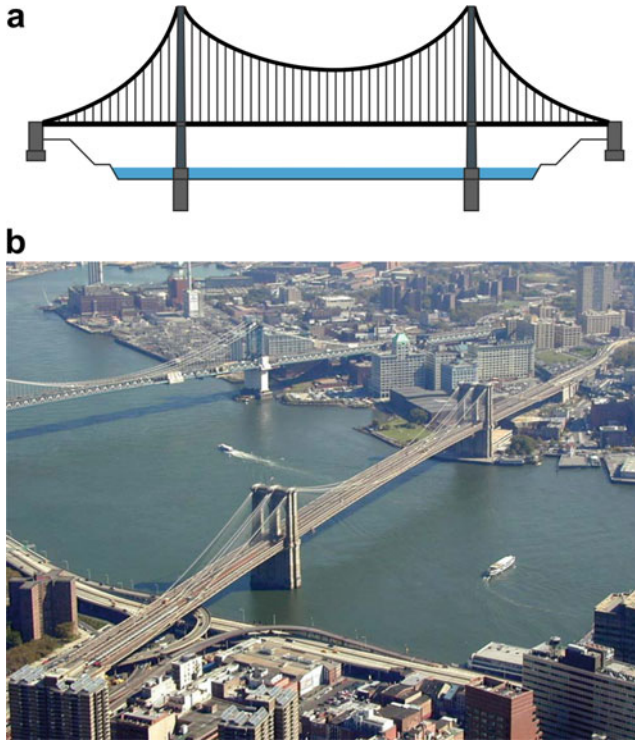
(a) Cables loaded with hanging load. (b) Brooklyn Suspension Bridge
